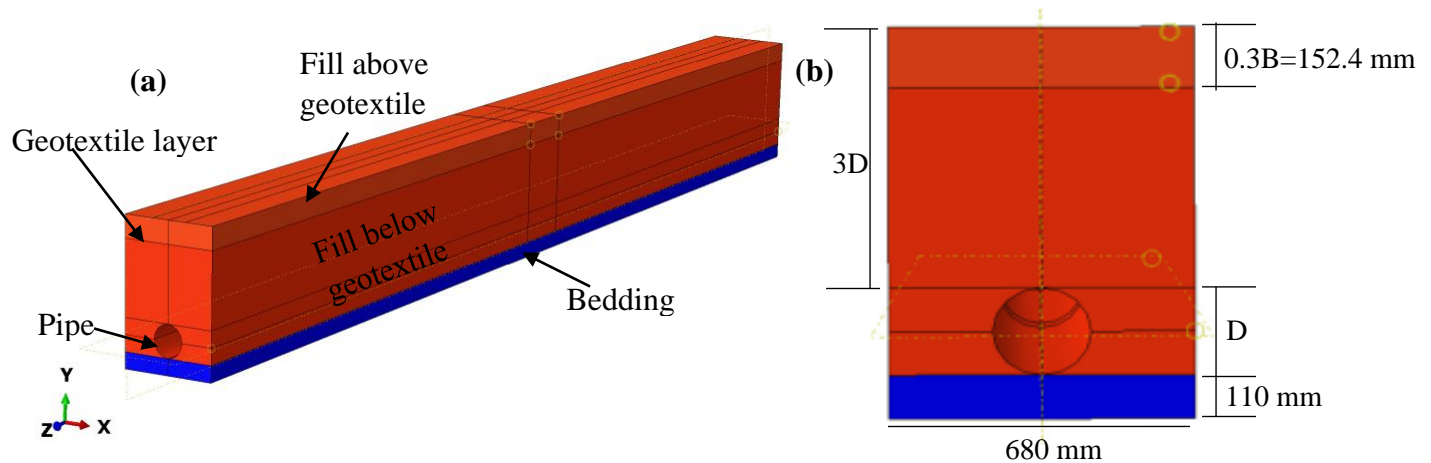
Geometry of Geotextile reinforced trench model (a) 3D view of geotextile reinforced trench model, (b) sectional view of geotextile reinforced trench model
